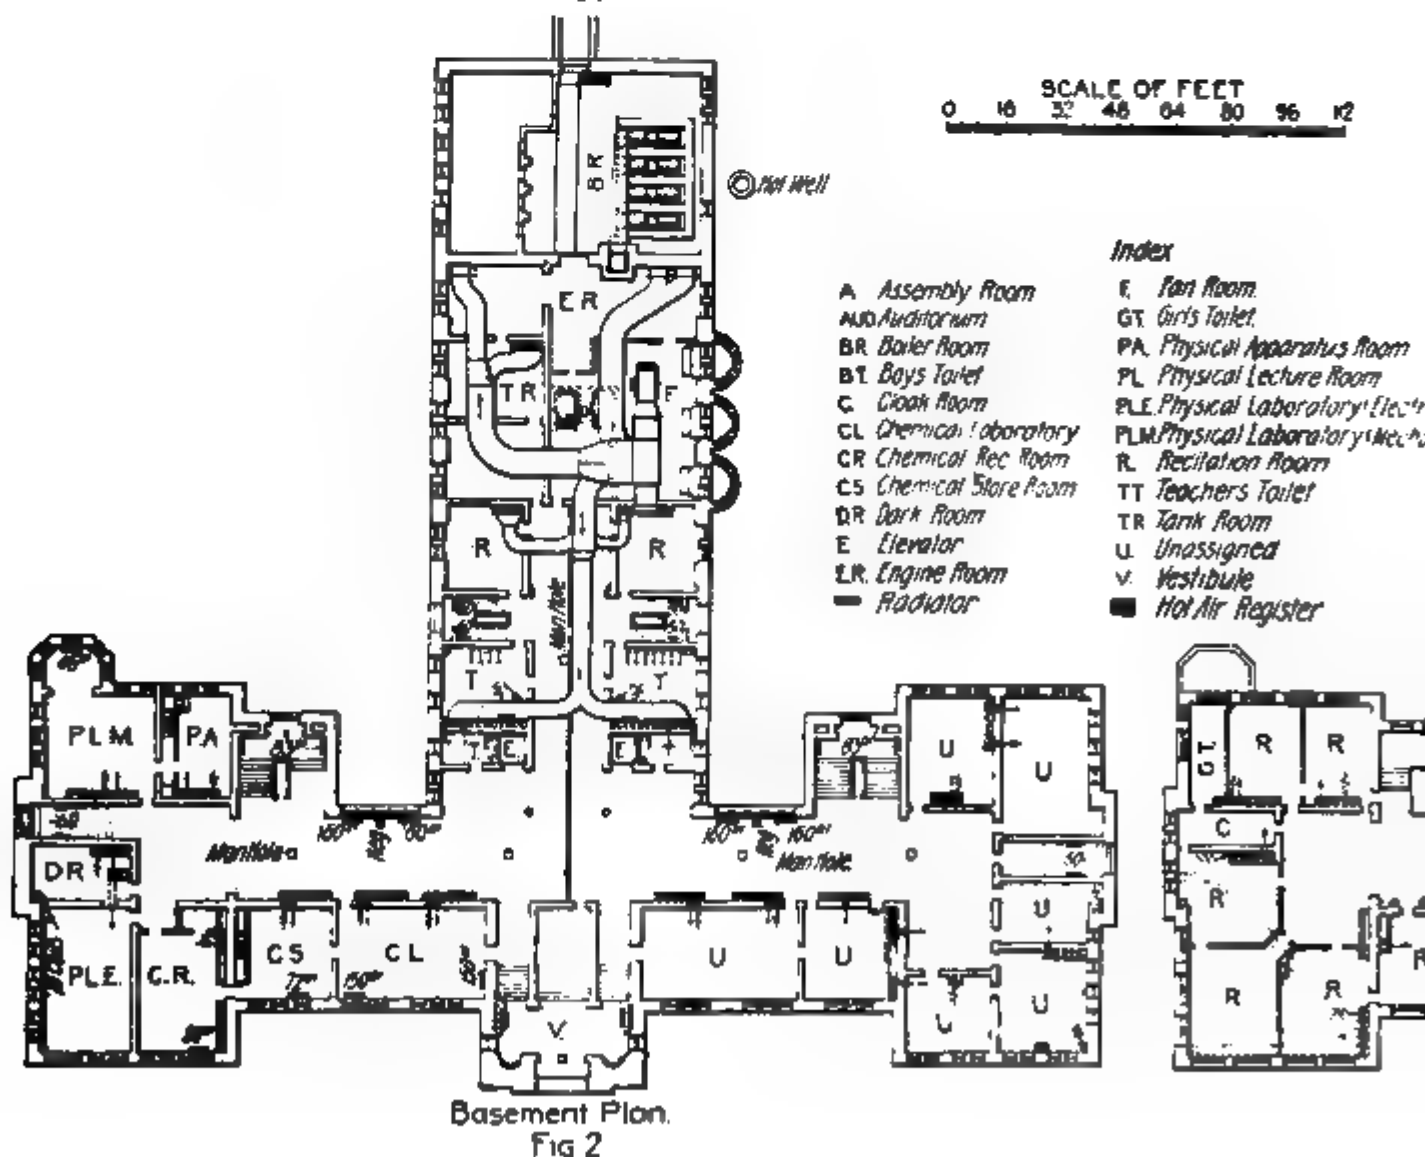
is a plan of the foundation. Figures 2, 3 and 4 are plans of the basement, first and third floors respectively. The second floor being almost an exact duplicate of the first floor, it was omitted from the description. Figure 5 is a plan of the boiler, heater, engine and fan-rooms, which are located in the rear of the building. The entire building is heated by the hot-blast or blower system, with the exception of the front vestibule, which is heated by radiators. The corridors, lavatories and a number of other rooms are provided with radiators for keeping these rooms warm at night or at other times when the fans are not in operation, it being intended to run the fans only when the school is in session.
